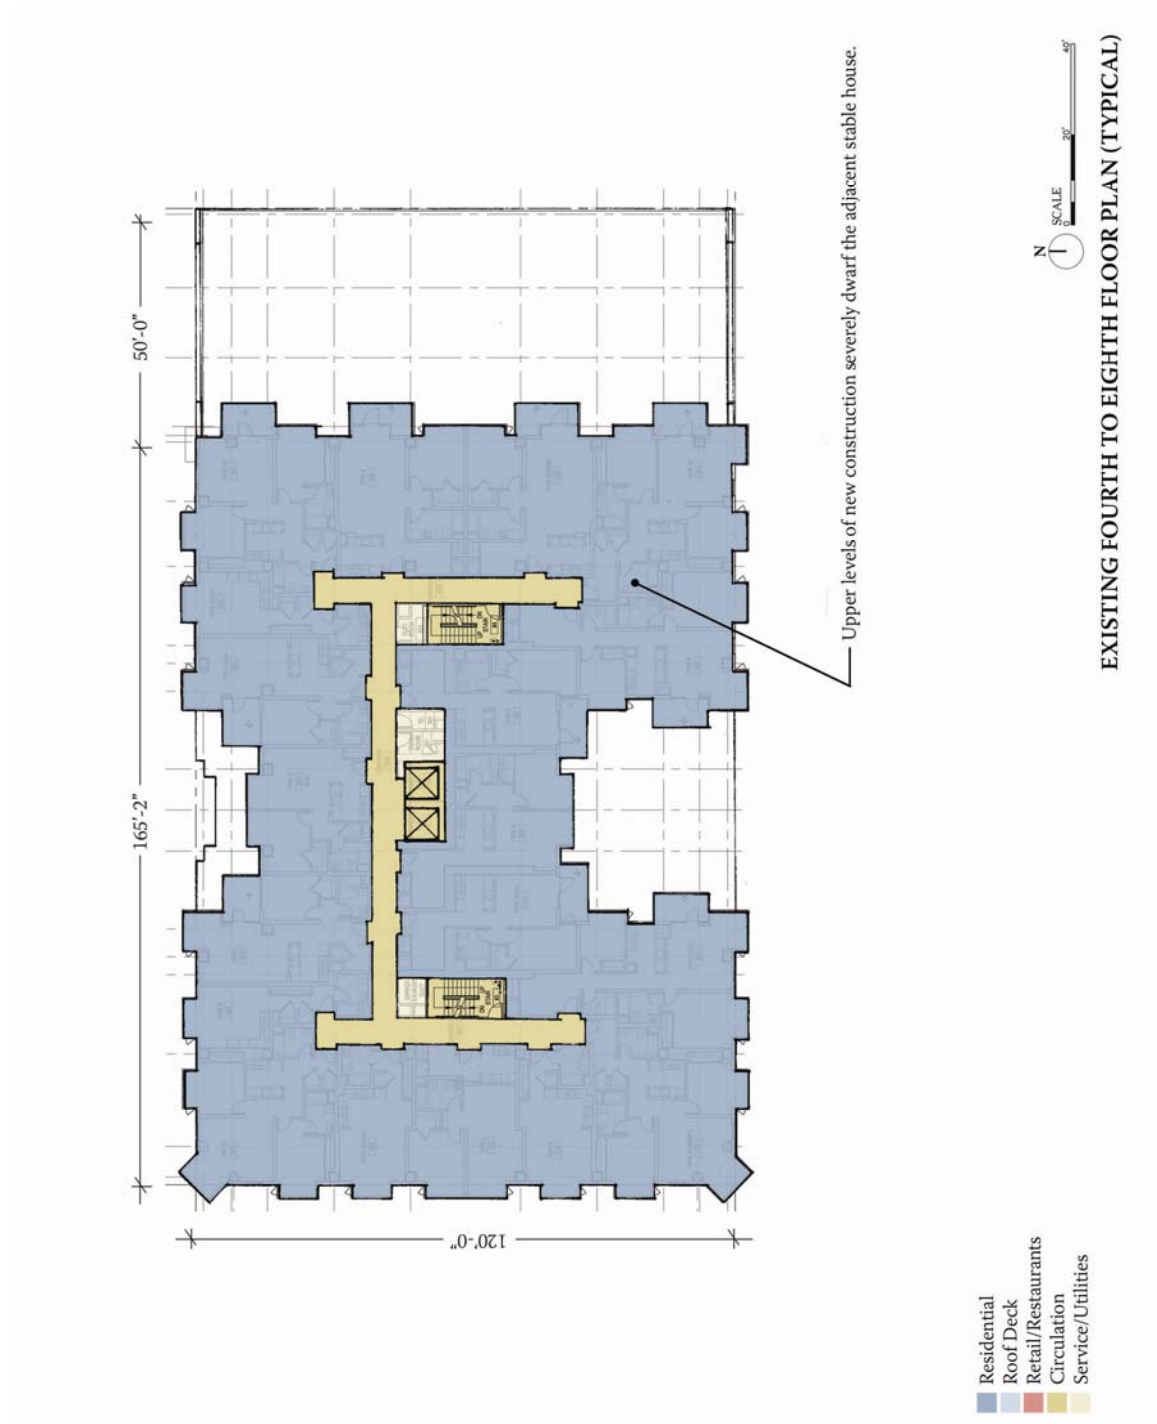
Existing Fourth to Eighth Floor Plan (Typical)
